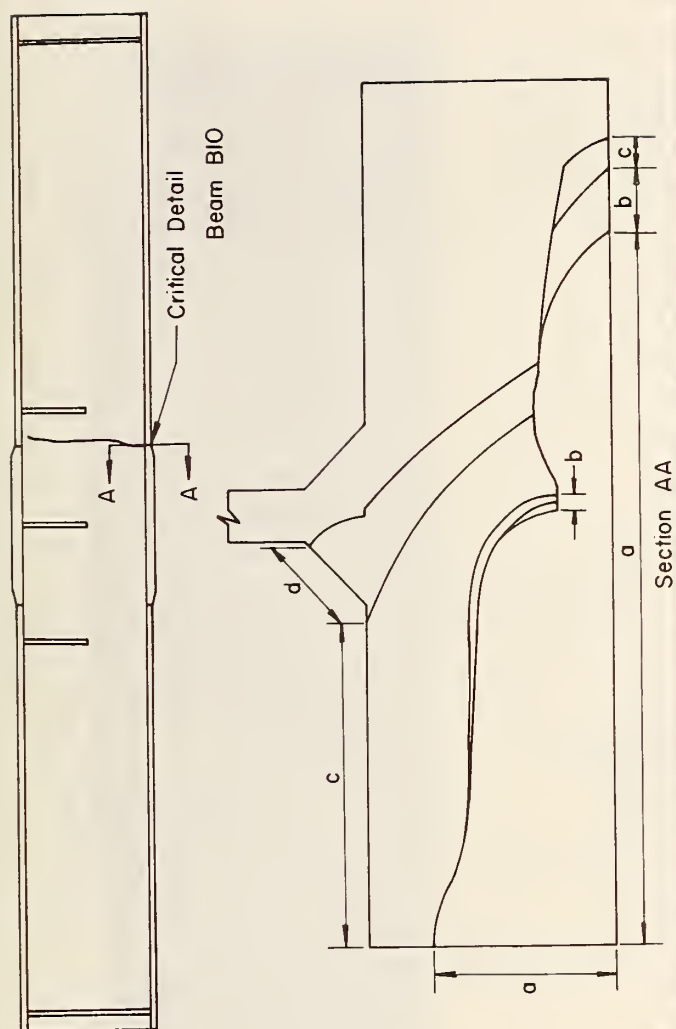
Fatigue and Fracture Surface, B10 (A36)
